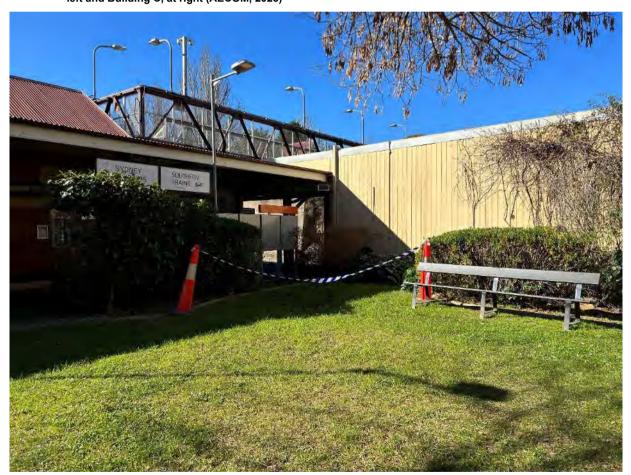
Courtyard looking northeast showing Argyle Street footbridge and marked out area for proposed lift (AECOM, 2023)
